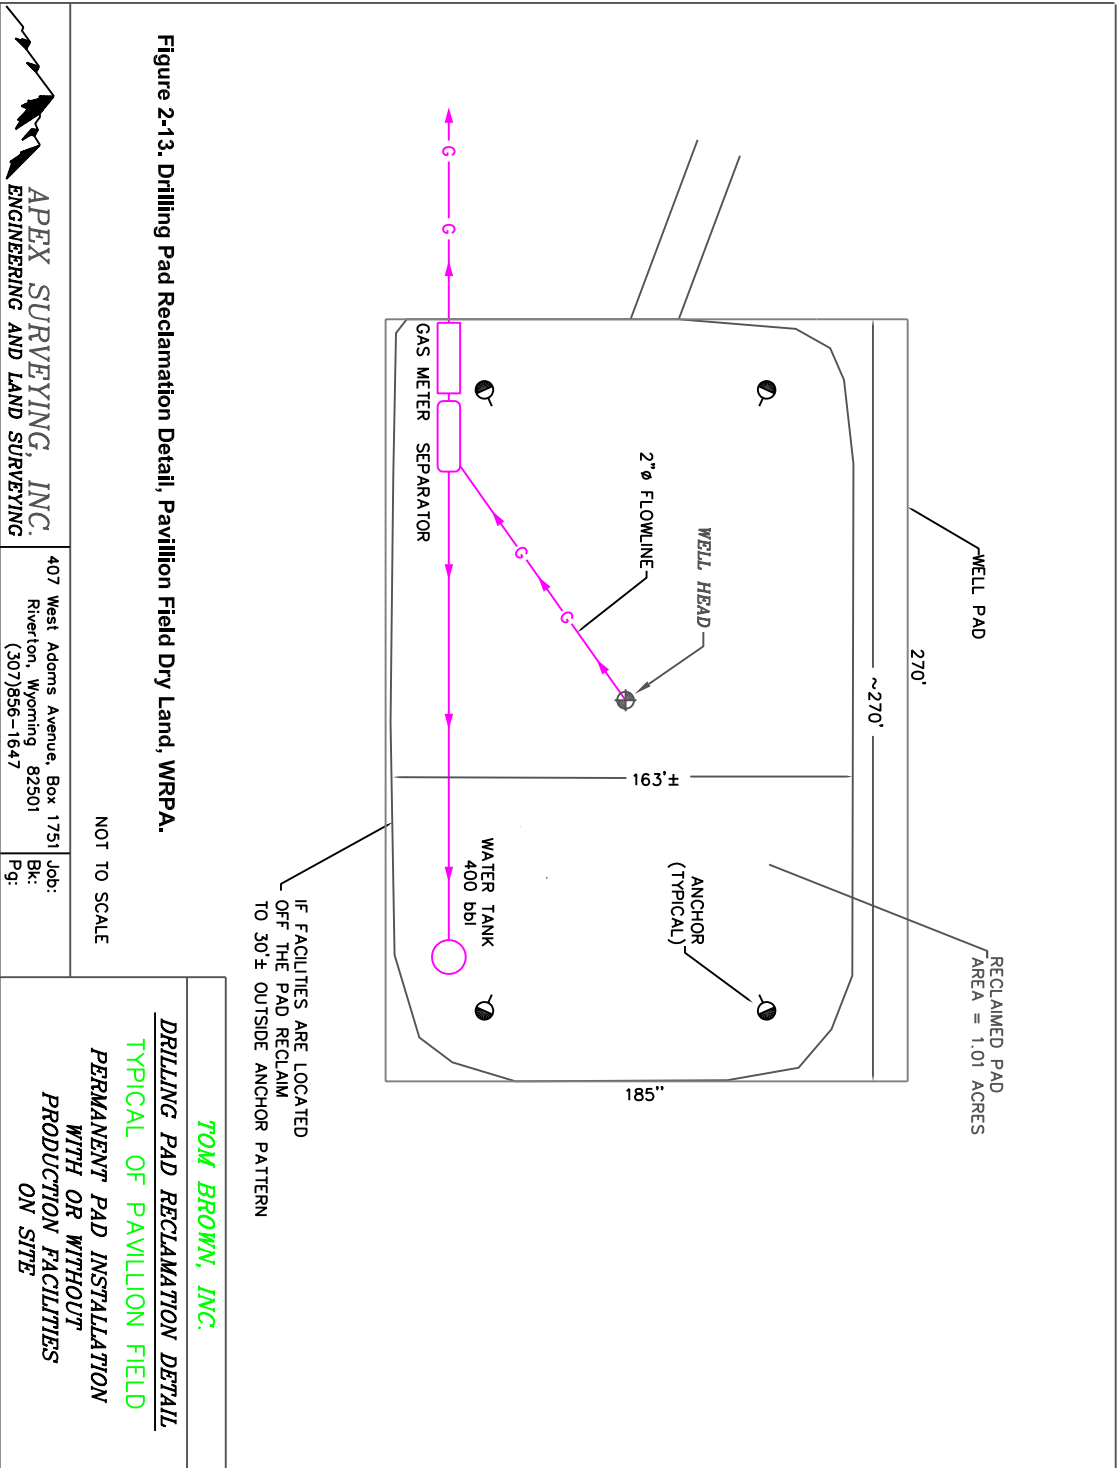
Drilling Pad Reclamation Detail, Pavillion Field Dry Land, WRPA.
